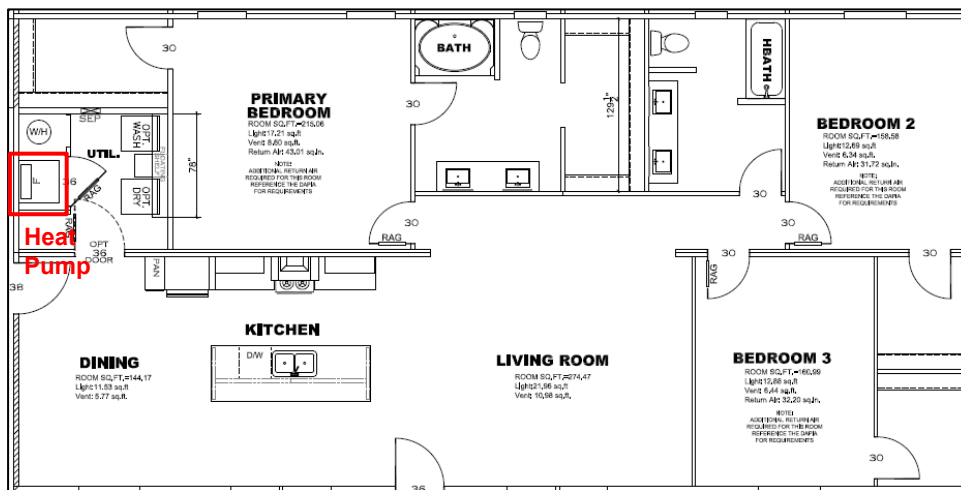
Original Floor Plan Layout for Home With Packaged Unitary System
